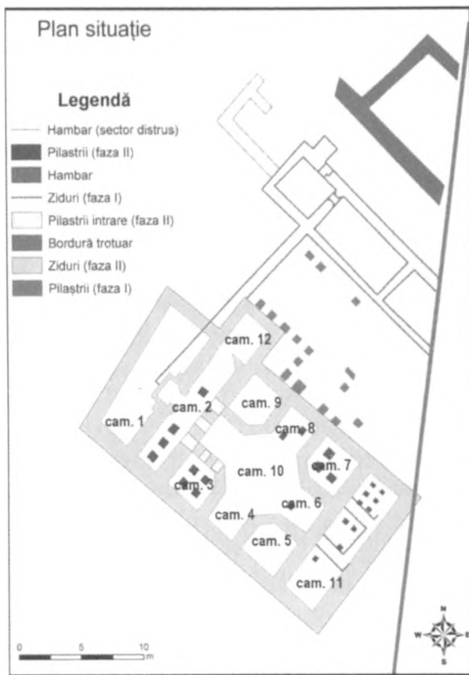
Plan of the building C7, Turkish Baths, phase II
